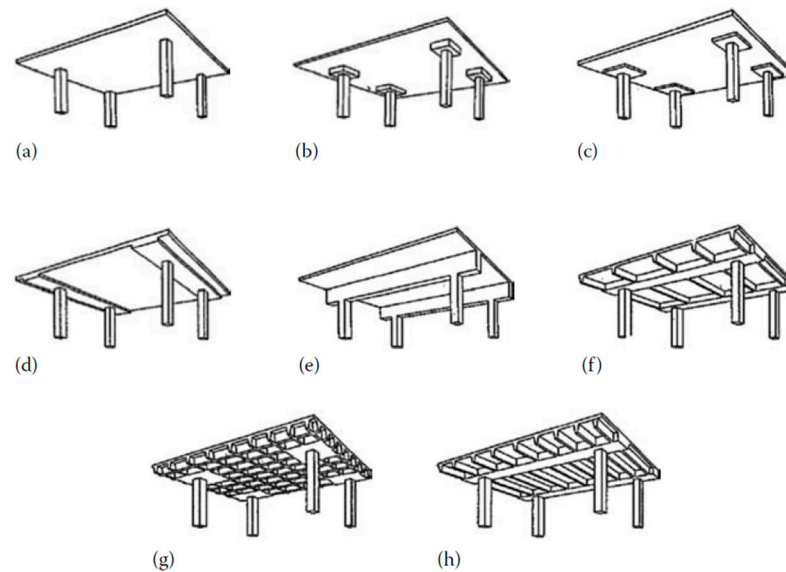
The major types of floor systems: (a) Flat plate; (b) Flat plate with column capitals; (c) Flat plate with drop panels; (d) Band beams; (e) One-way beam and slab; (f) Skip joist system; (g) Two-way joist slab; and (h) Standard joist system [195].
